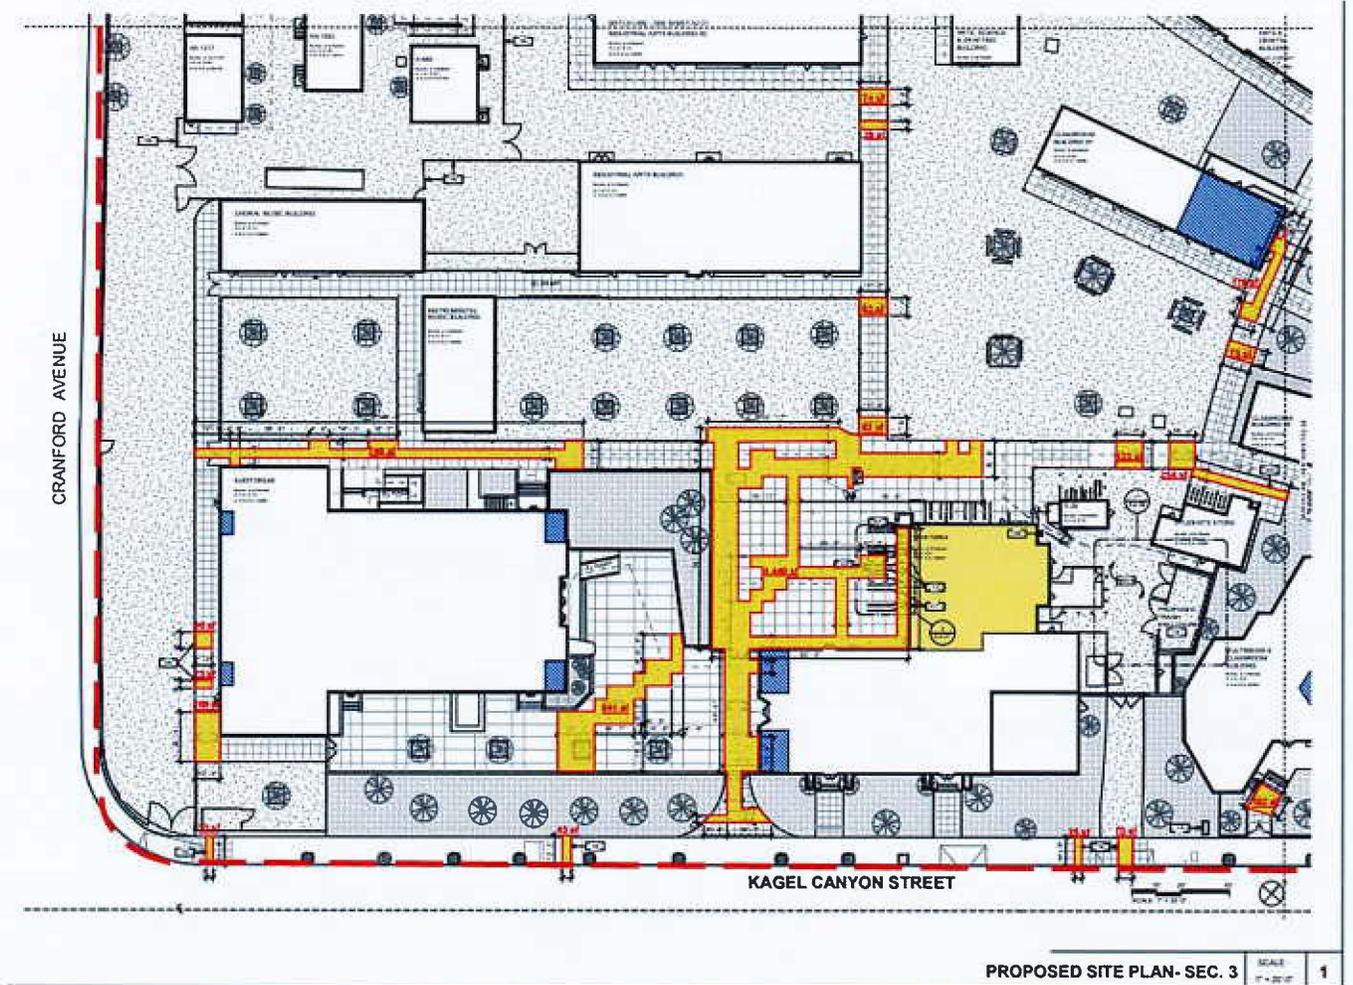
Proposed Site Plan: Kagel Canyon Street (East Side of Campus)
